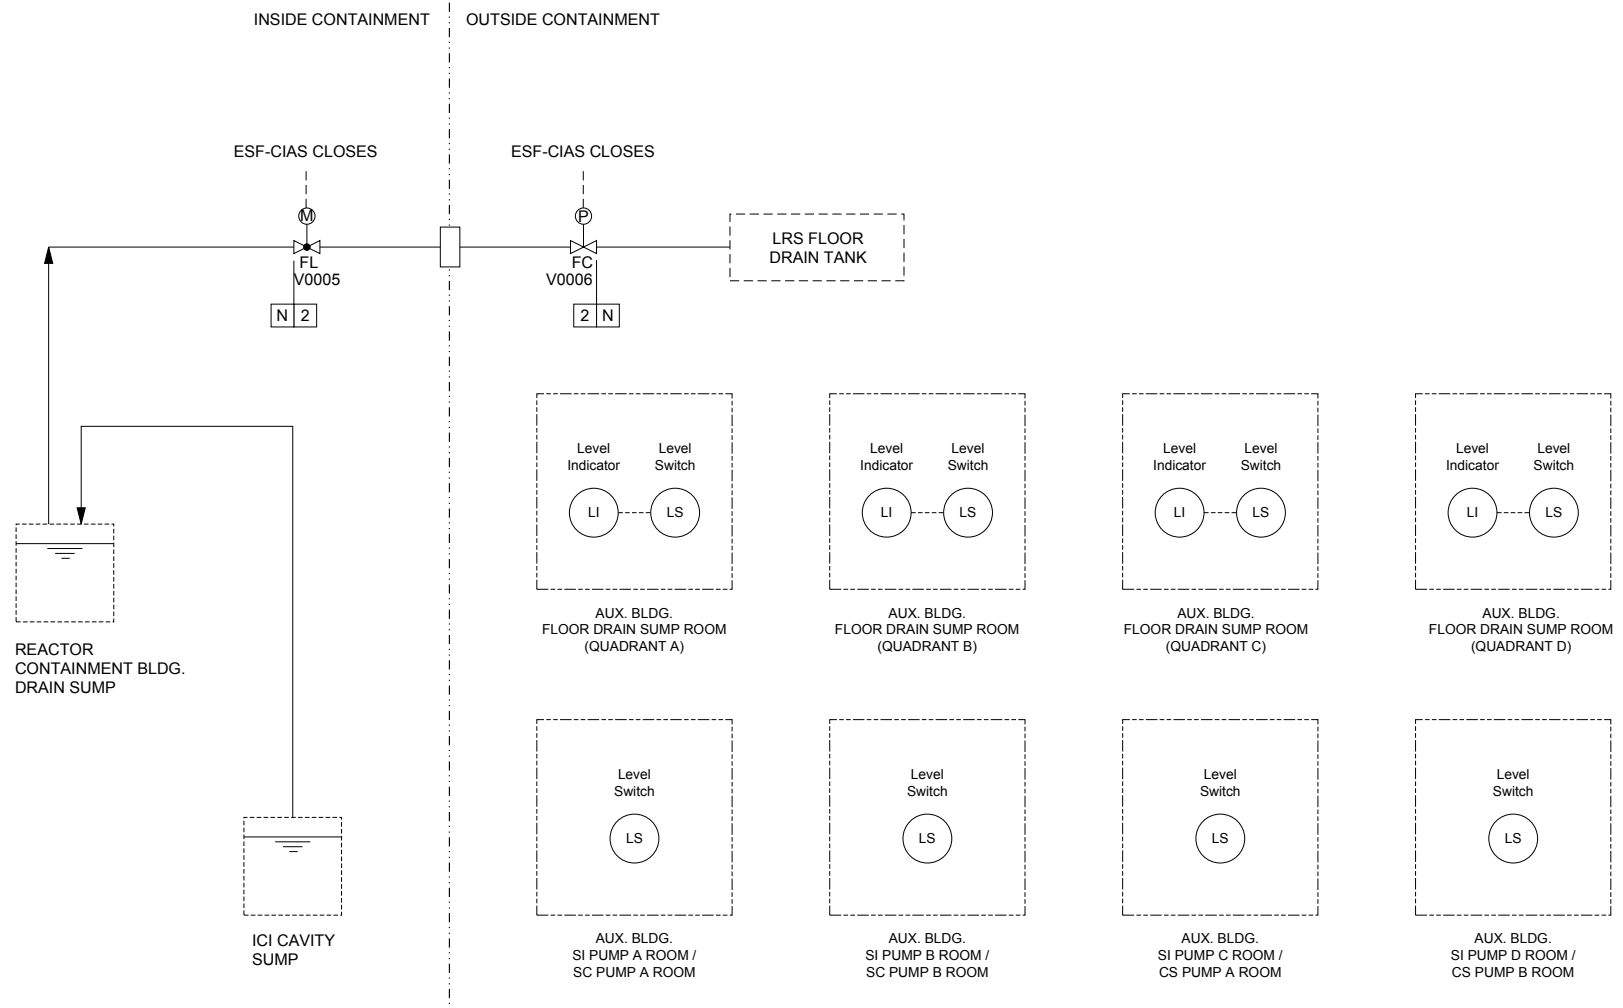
Equipment and Floor Drainage System
